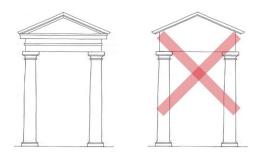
G.4.c: Columns spanned by a visually structural element
